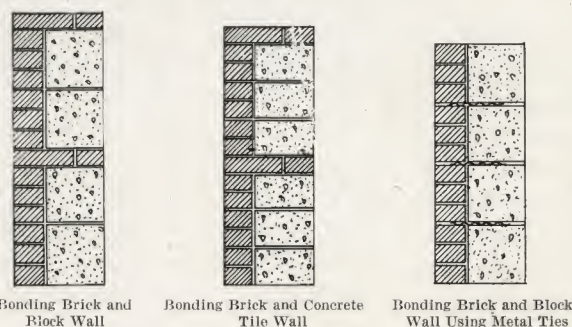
Usual methods of bonding brick veneer to walls having a backing of concrete block or building tile.
